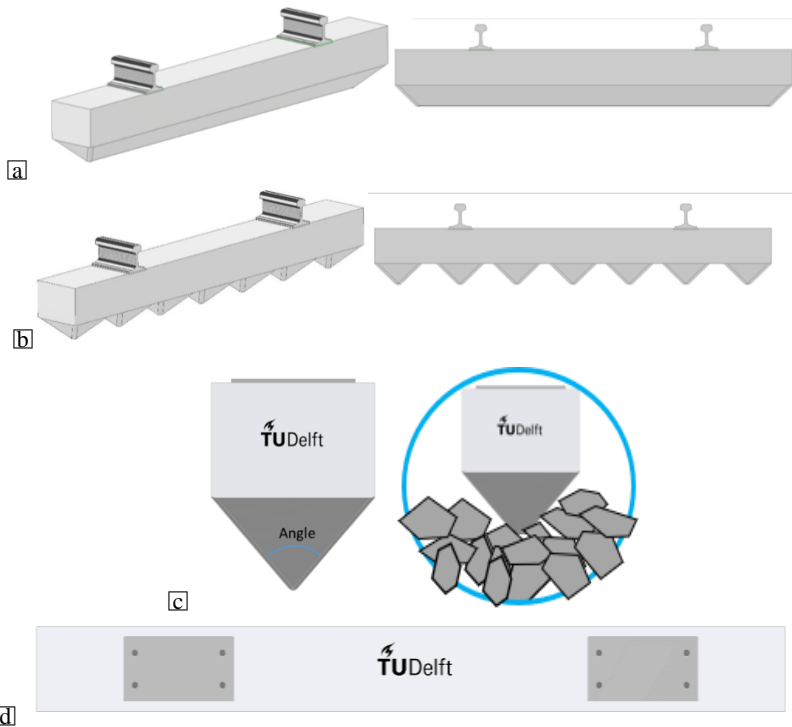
Wedge-sleeper designs. (a) Single wedge design, (b) Multi-wedge design, (c) Side-view of both designs, (d) Top-view of both designs
